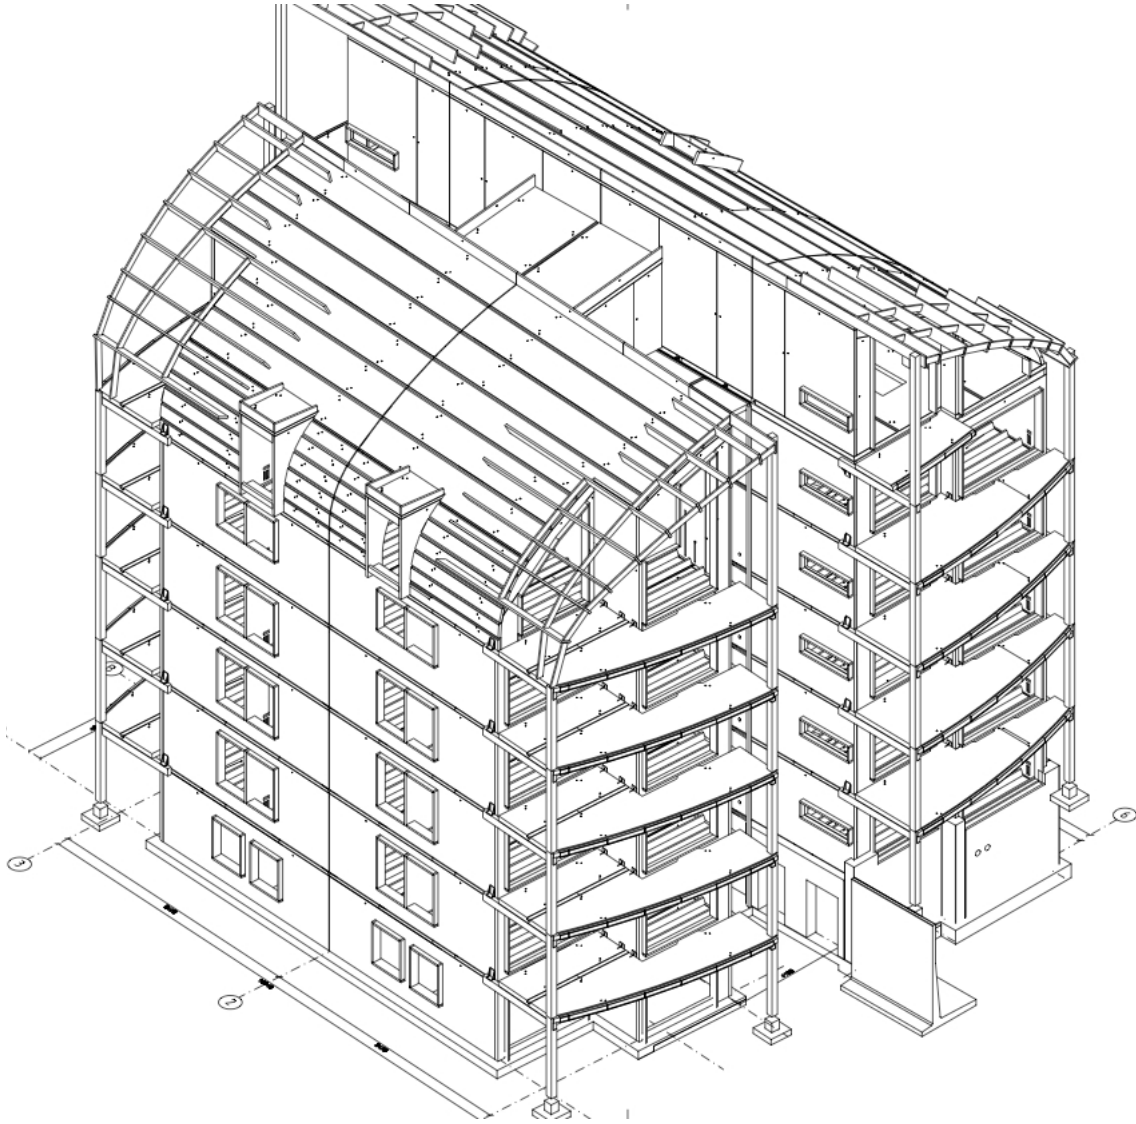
Isometric view of the whole construction, showing only the CLT elements assembled and the concrete parts of the basement and the buildings' foundations. Picture by FristadsBygg [7].
